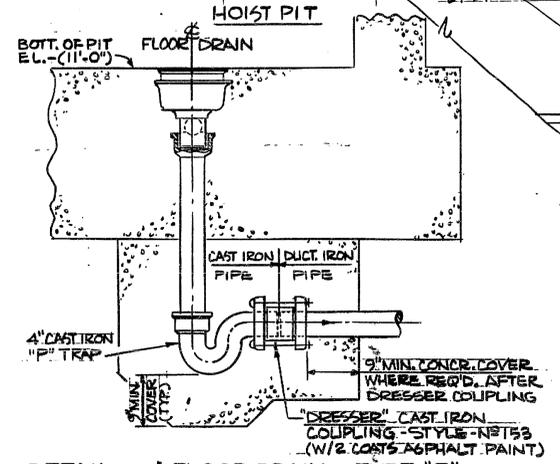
" FLOOR DRAIN - TYPE "A"
